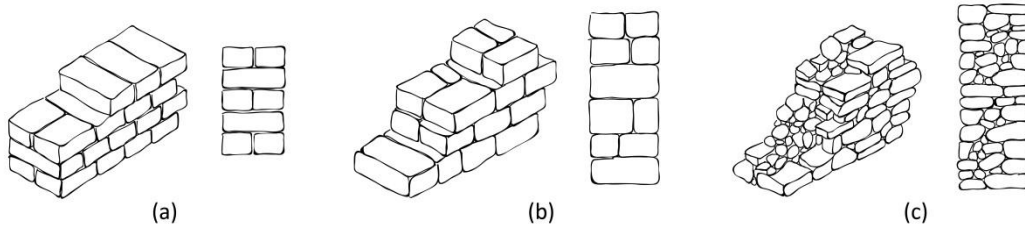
Different masonry units (view and cross-section): (a) brick masonry; (b) ashlar stone masonry; and (c) irregular stone masonry (adapted from NIKER 2010)
